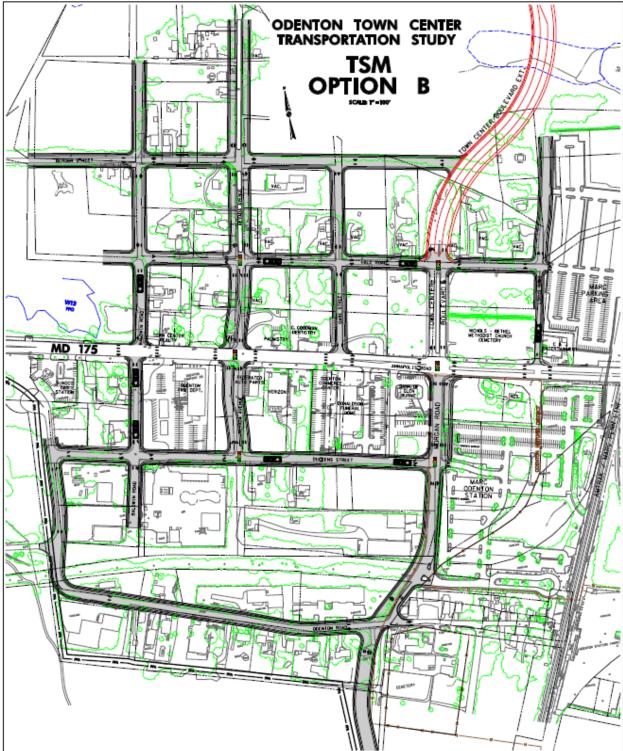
Concept Plan – Odenton Town Center TSM Option B
